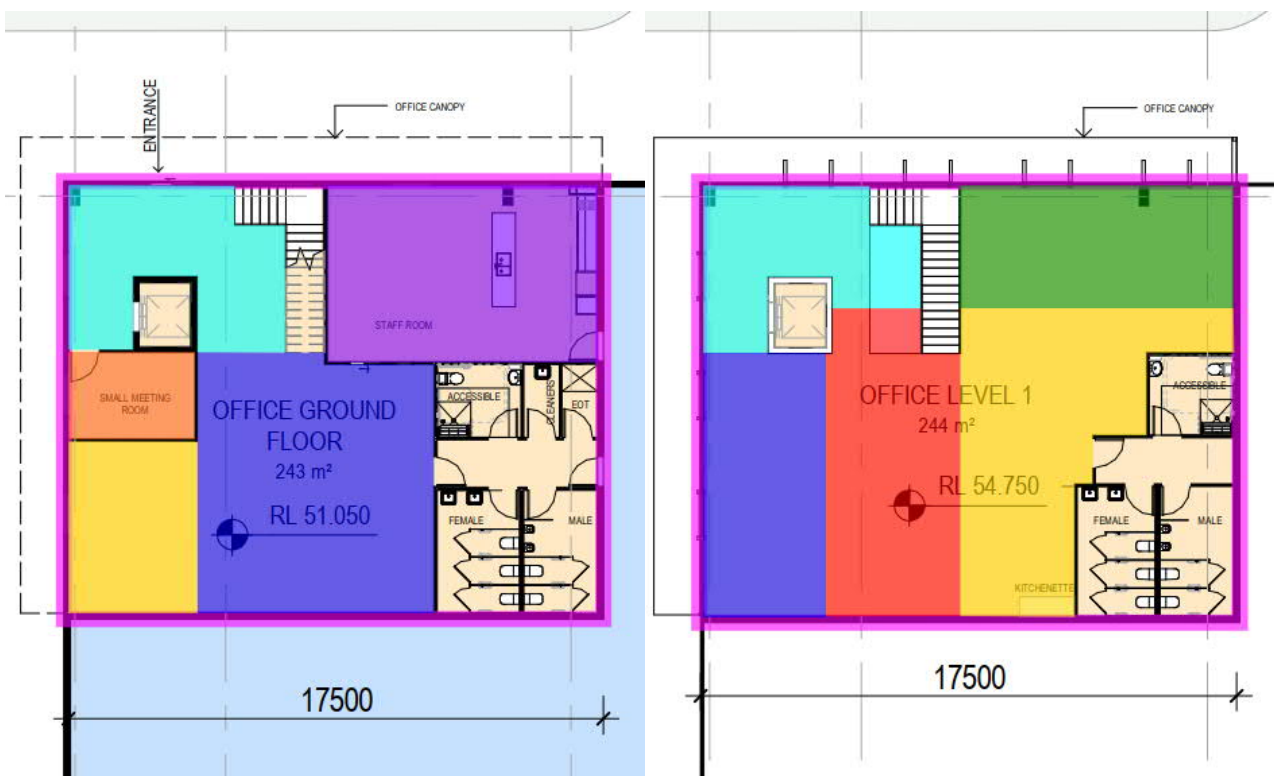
HVAC zones and thermal envelope for 2 Senator Drive Ground Floor (Left) and First Floor (Right)
